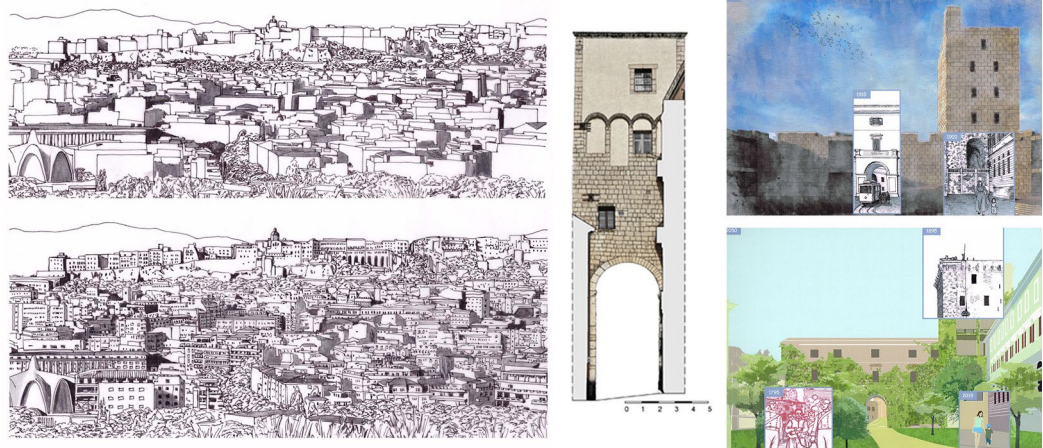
Some examples of materials belonging to a Drawing Laboratory.
